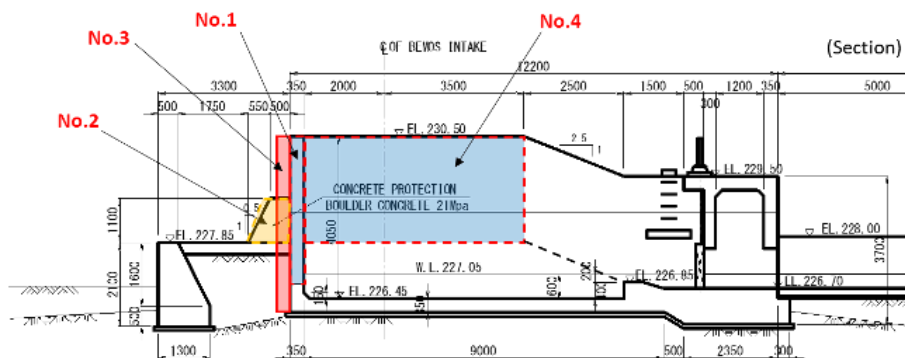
Rehabilitation Plan from No.1 to No.4
